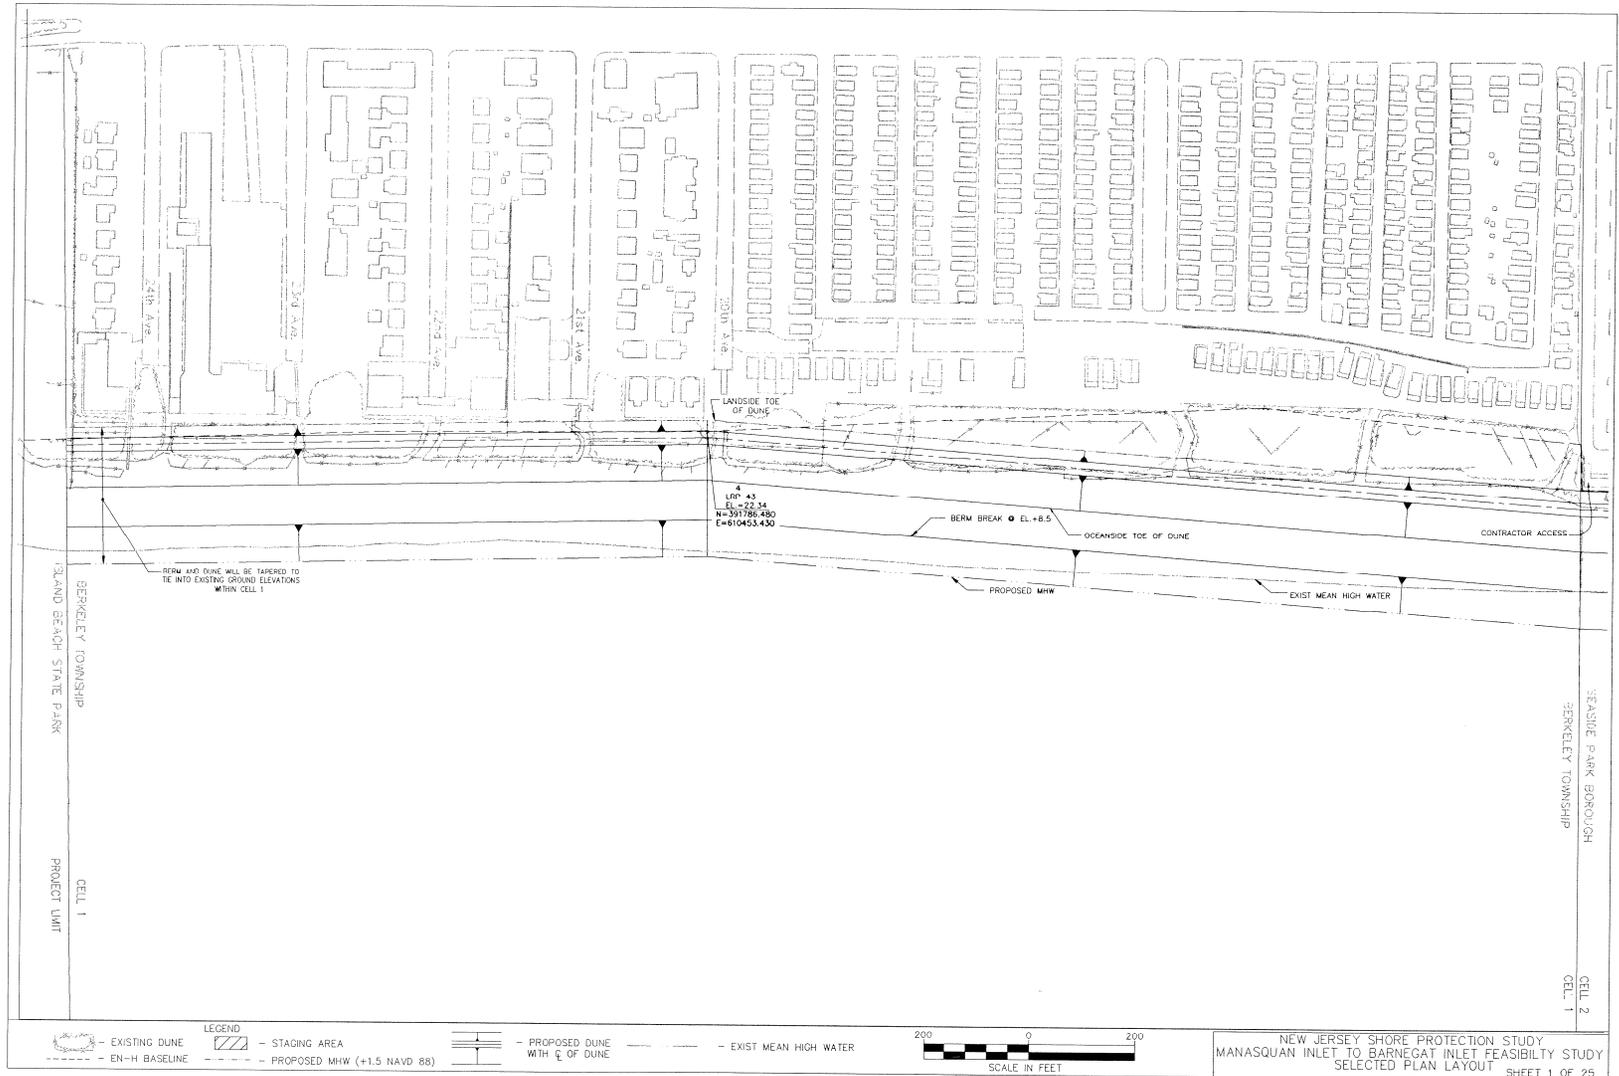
Selected Plan Layout – Berkeley Township, South Seaside Park
